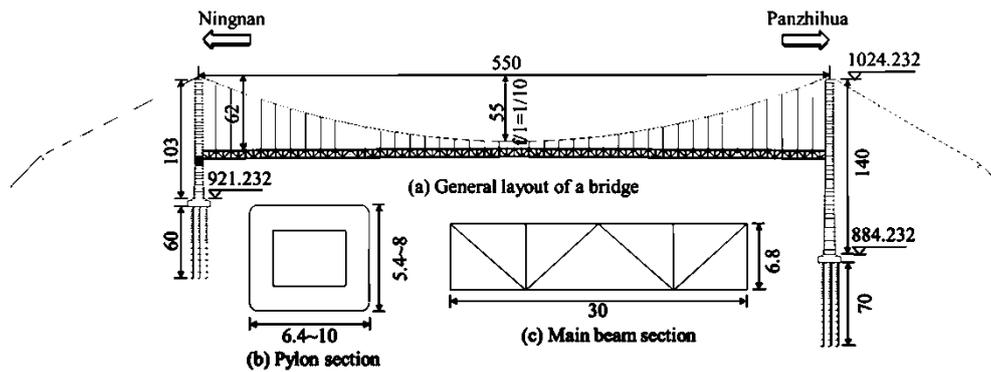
General layout of bridge and detailed drawing of components (unit: m)
